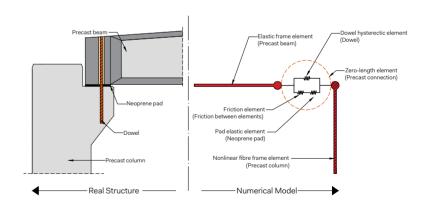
· Beam-to-column connections in conventional PRC buildings: common configuration (left) and numerical arrangement adopted (right)
